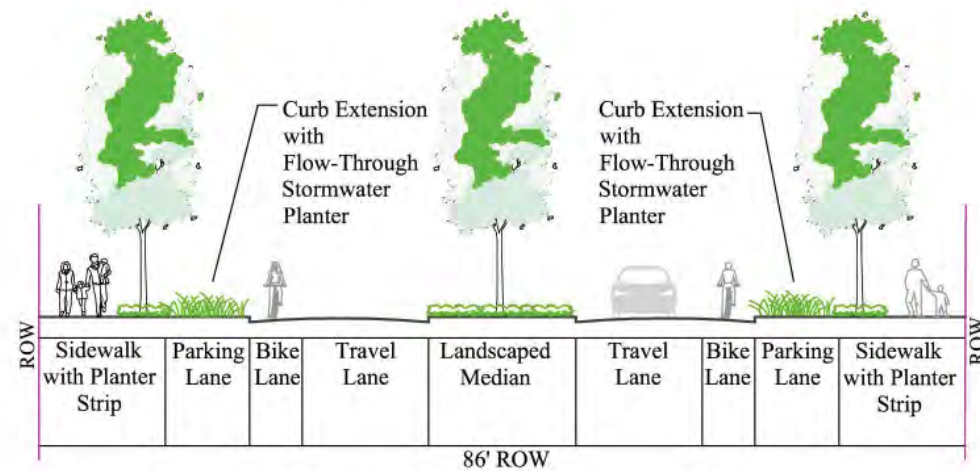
Ridge Parkway and Central Parkway Green Streets
